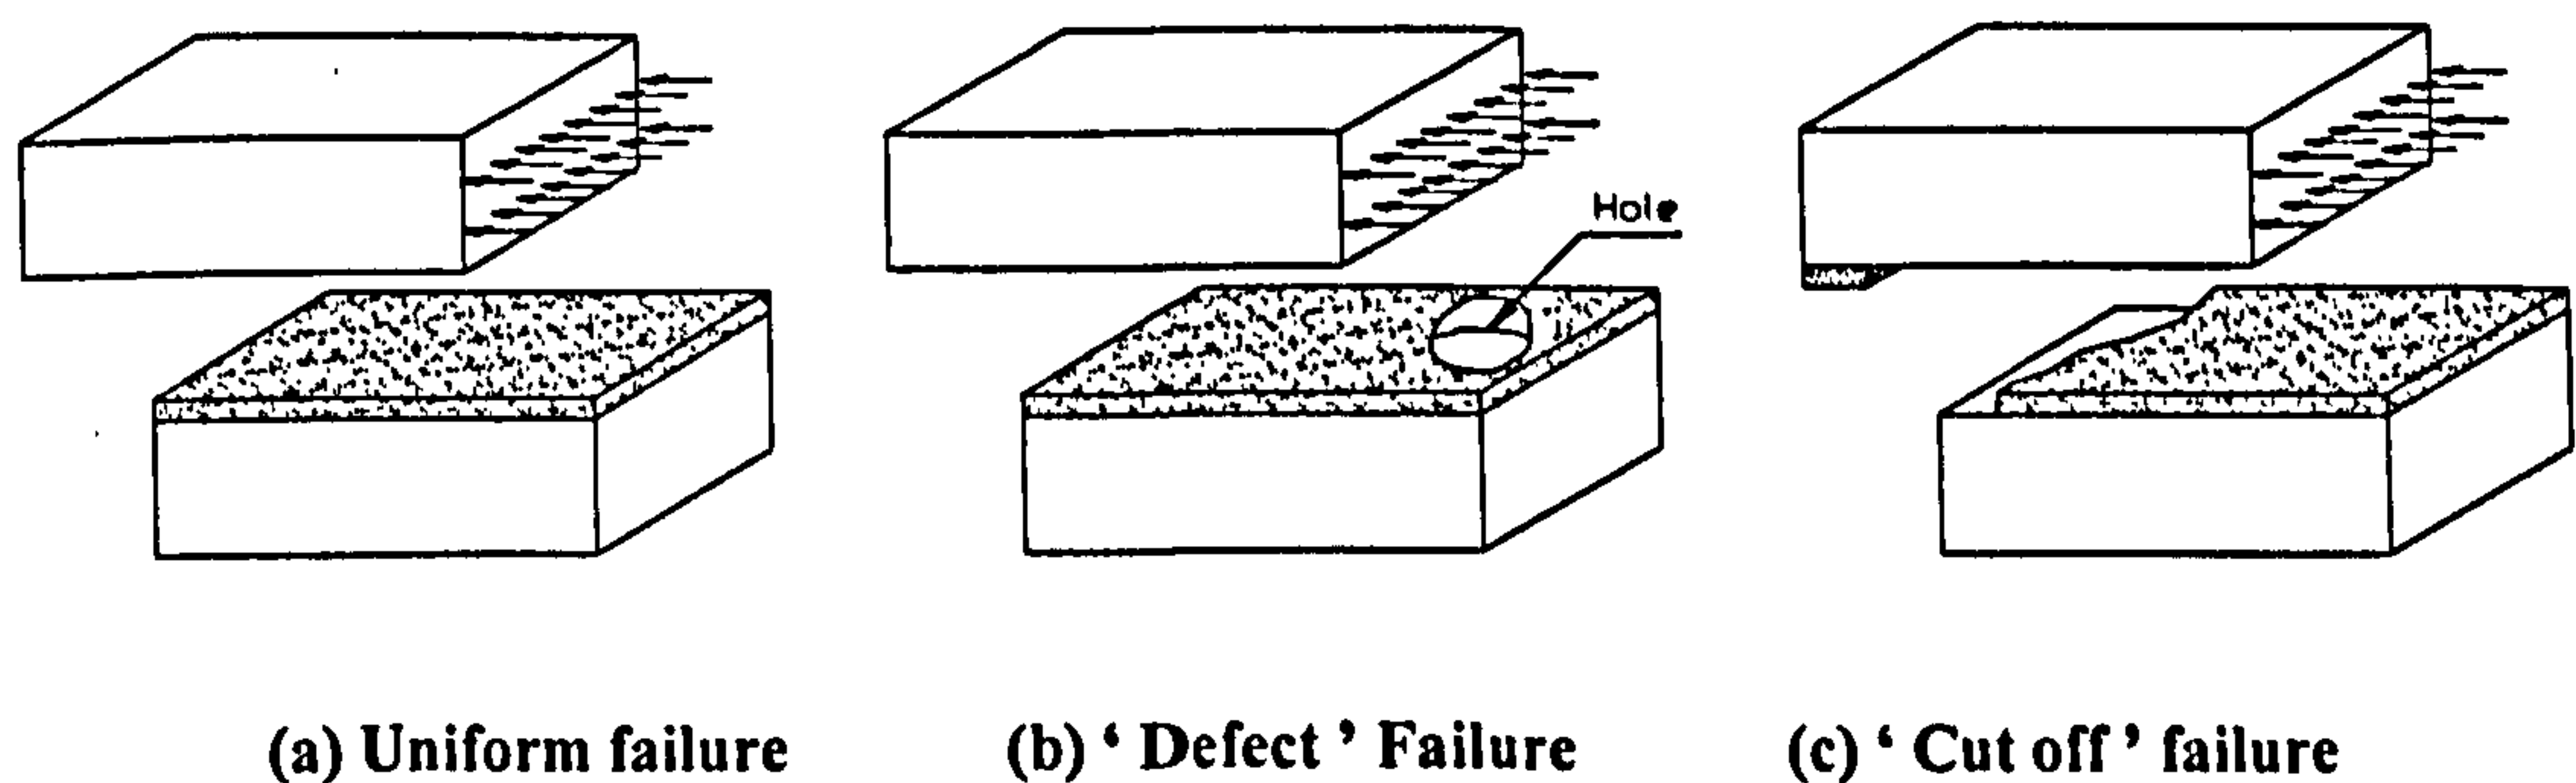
Typical Failure Modes of Brickwork Prism Under Shearing
